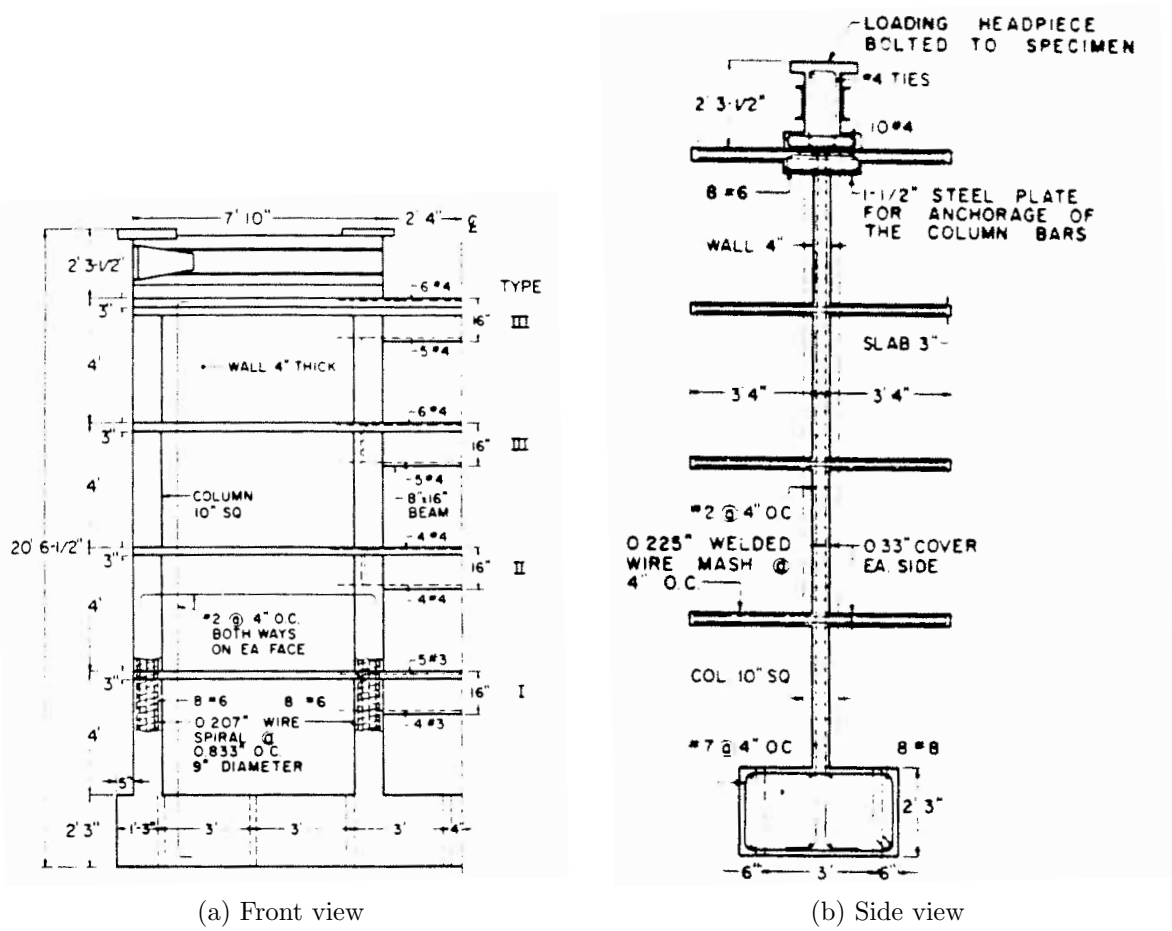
Test specimen geometry and wall pier reinforcement detail (Ozselcuk, 1989)
